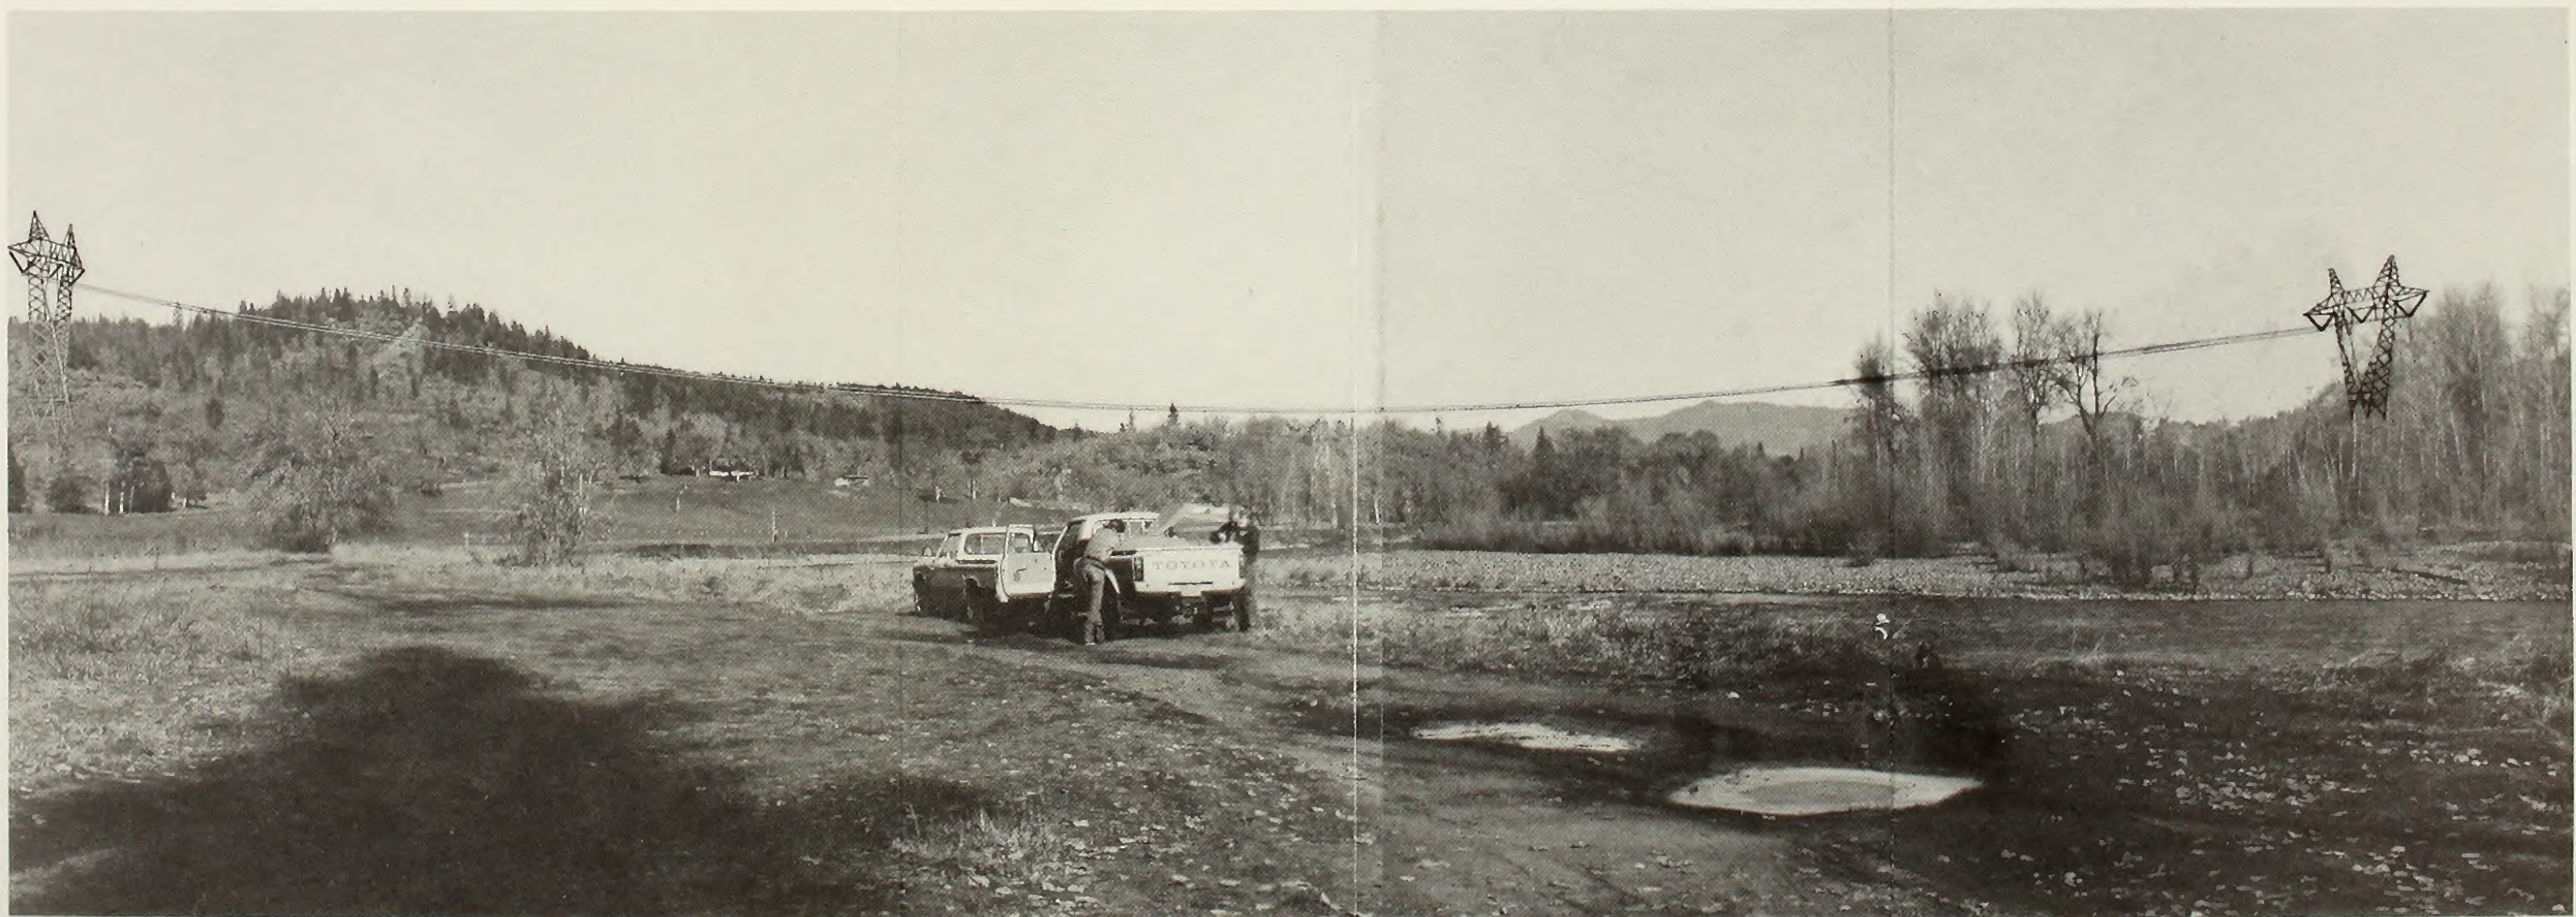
SIMULATED VIEW OF PREFERRED ALTERNATIVE AT ROGUE RIVER CROSSING (SINGLE CIRCUIT STEEL LATTICE STRUCTURES). IN ACCORDANCE WITH A PLANTING PLAN TO BE NEGOTIATED WITH THE JACKSON PARKS AND RECREATION DEPARTMENT, TREES AND SHRUBS WOULD BE PLANTED TO HELP SCREEN THE LINE FROM RECREATION ACTIVITY AREAS.
